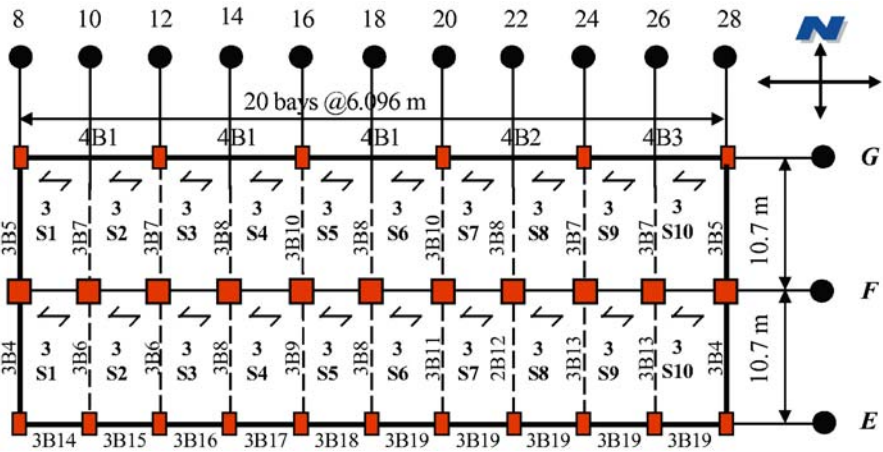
Plan of the third floor (not to scale). Courtesy: Kirkpatrick Consultants, Oklahoma, U.S.A., 2002, T. Bangash, Ph.D. Thesis, London University, 2004
